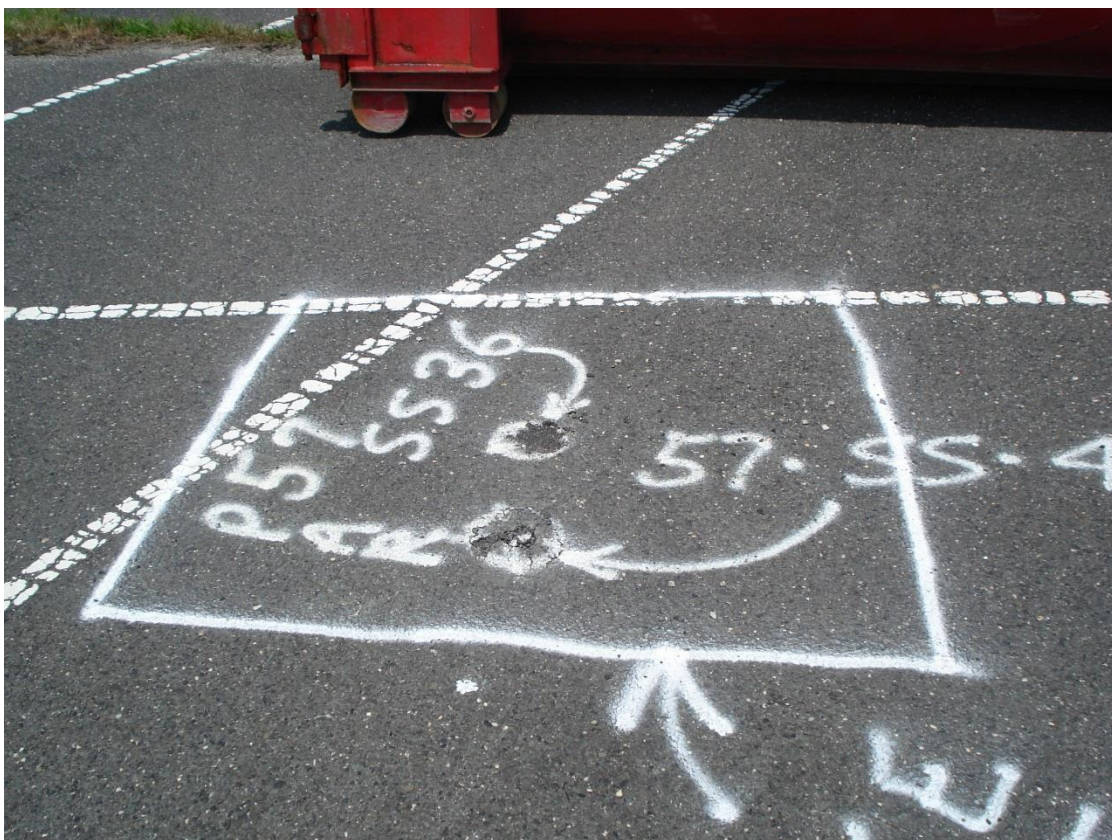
Parcel 49, backfilled excavation and adjacent area, view west, 01 August 2016.
